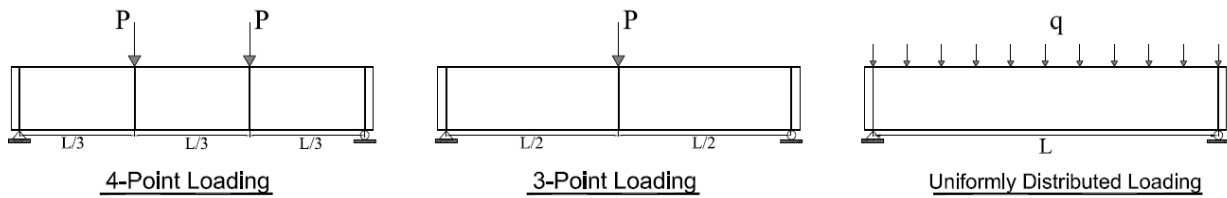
Studied loading patterns on the behaviour of reinforced I-beams under preloading
